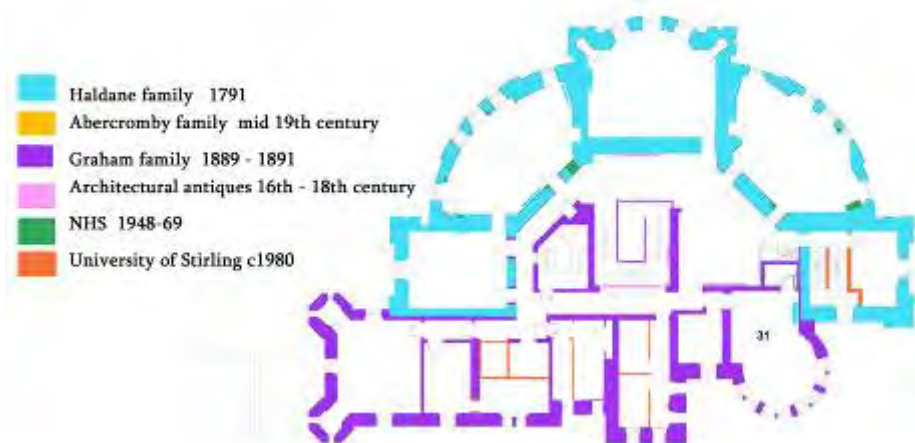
First floor plan of Airthrey Castle with historical analysis of existing fabric 2009 S&B
